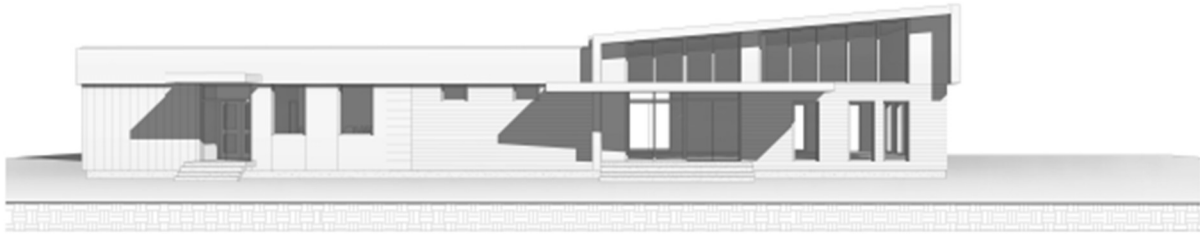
1 of 2 proposed designs for the new Rocky Mountain House Terminal Building
